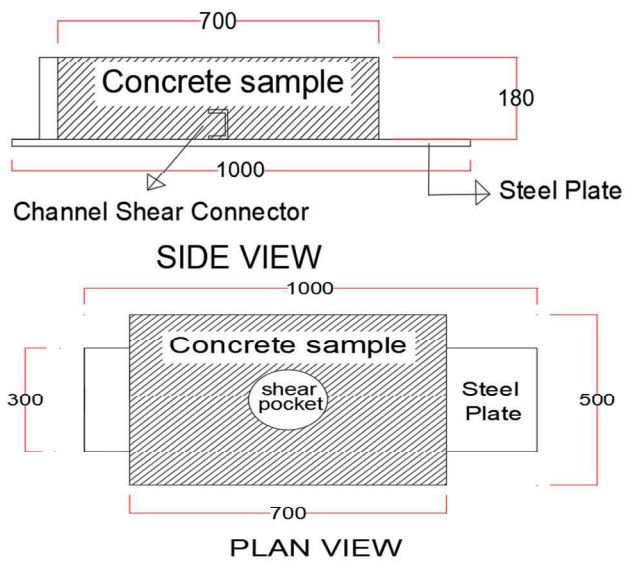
The details of pushout test specimen (a)Side View (b) Plan View
